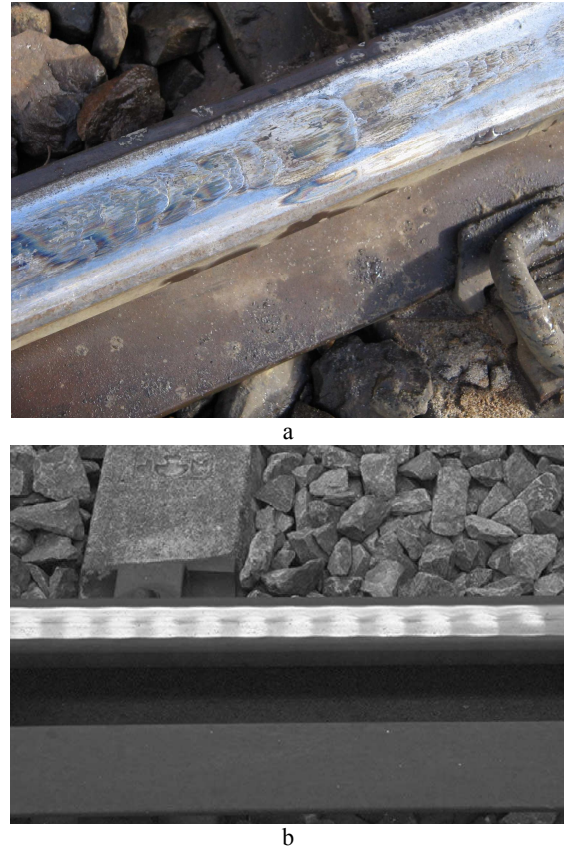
Kinds of defects caused by excessive supply of sand a – defect № 14; b – defect № 40
